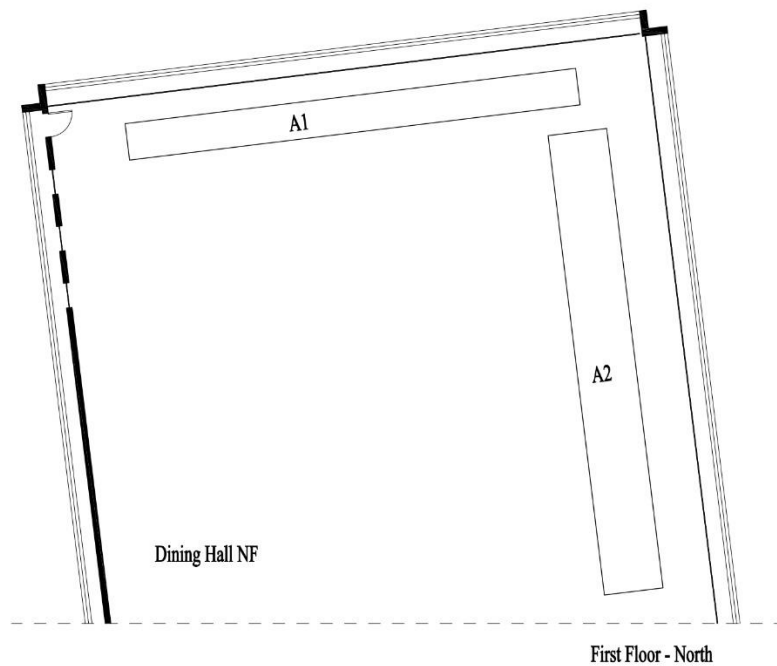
First Floor Plan and Temperature Data Notation of North Dining Hall
